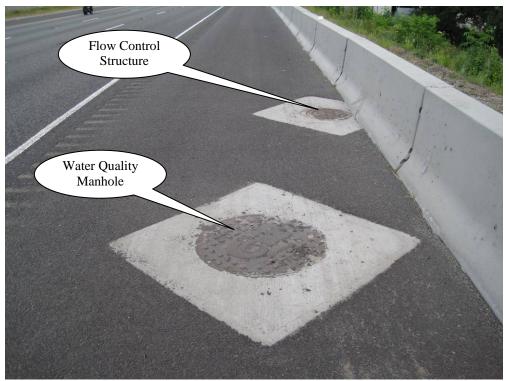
Detention pipe facility looking towards the north from the water quality manhole structure (DFI D00032) and the flow control structure.
